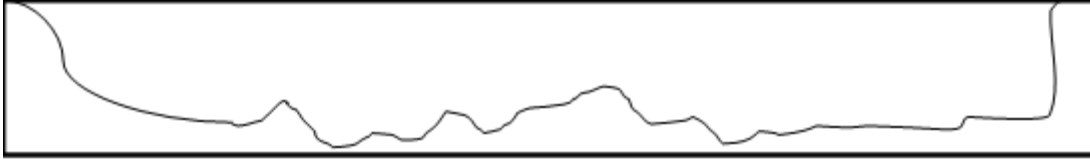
Typical corrosion pattern in a steel girder
